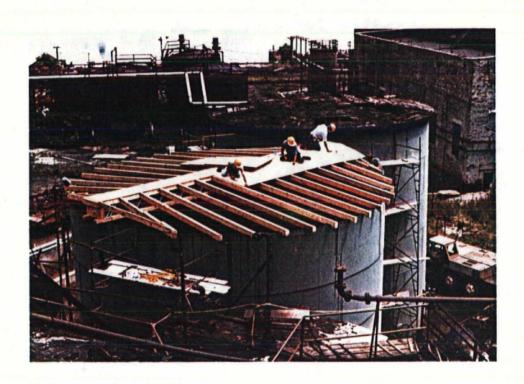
Constructing Tank D-14 Top. 7/29/85
